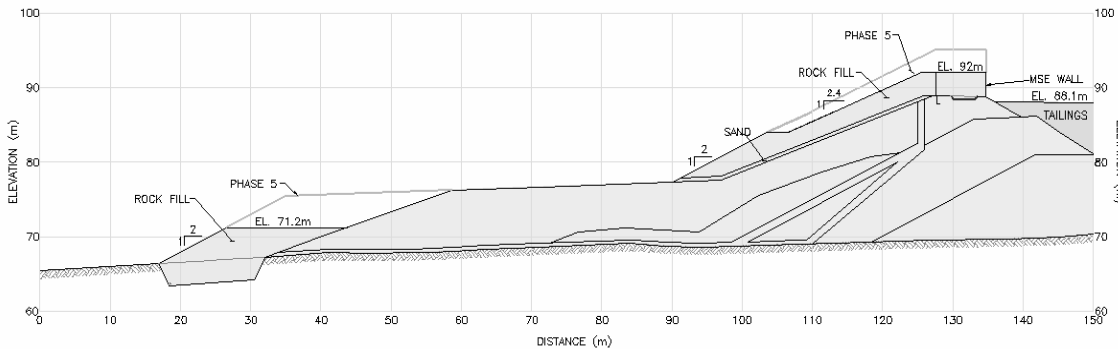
Typical section for the staged Cerro Santa Rosa Phase IV crest raise design.
